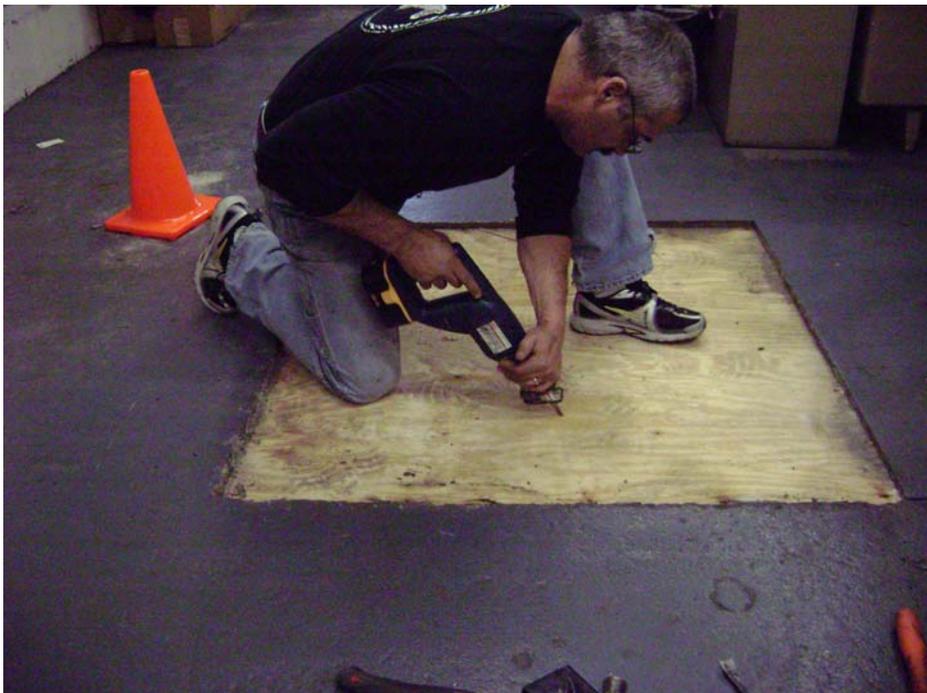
Removing wood plank layers from Vault #1 adjacent to MW15.
